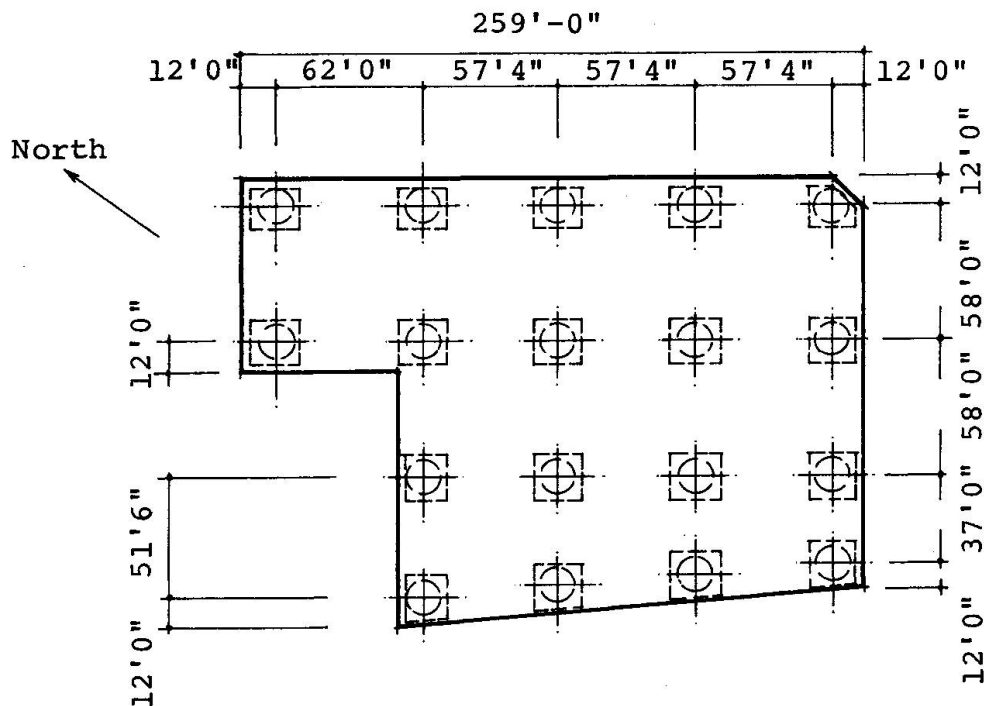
PLAN OF DECK AND COLUMN GRID LAYOUT
